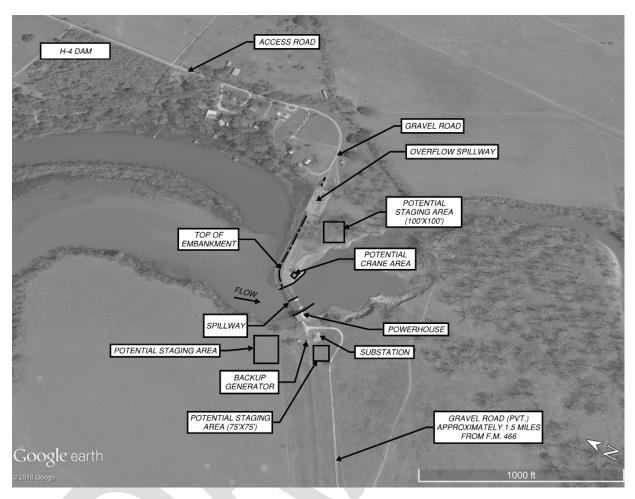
H-4 (Lake Gonzales) Spillway Site Plan
